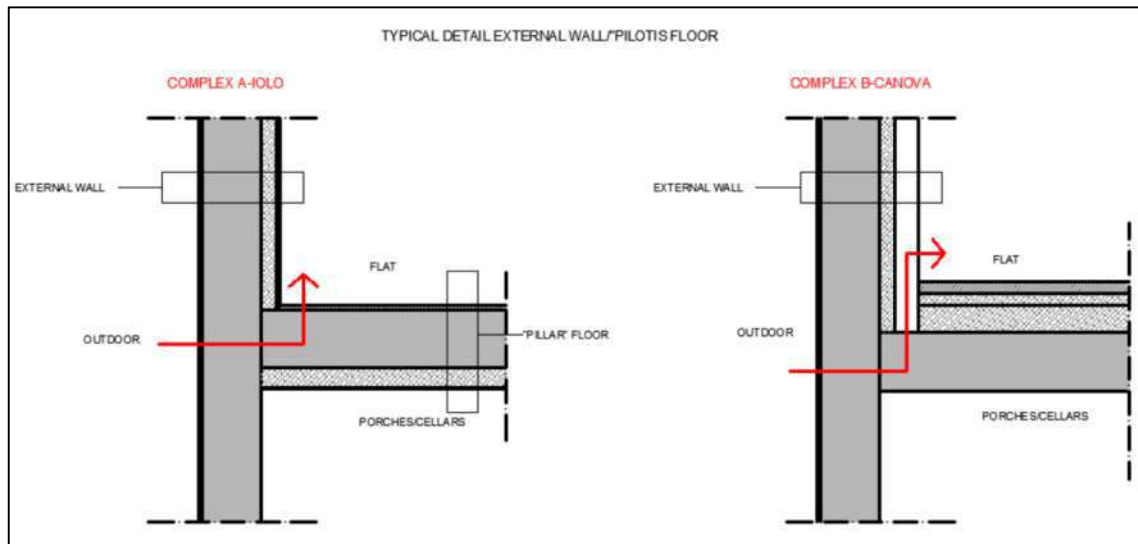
Typical thermal bridges in the 2 building complexes.
